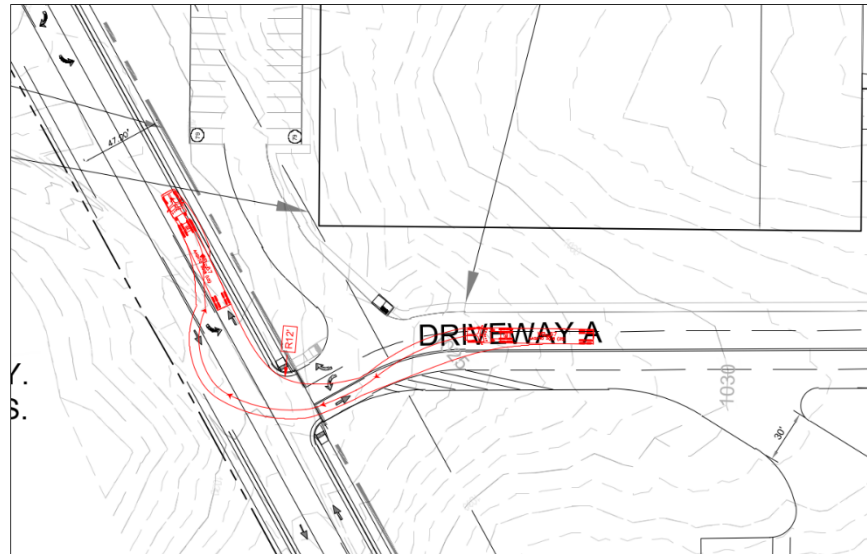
Stanley Road at Driveway A – Westbound Right (Exiting Truck)
